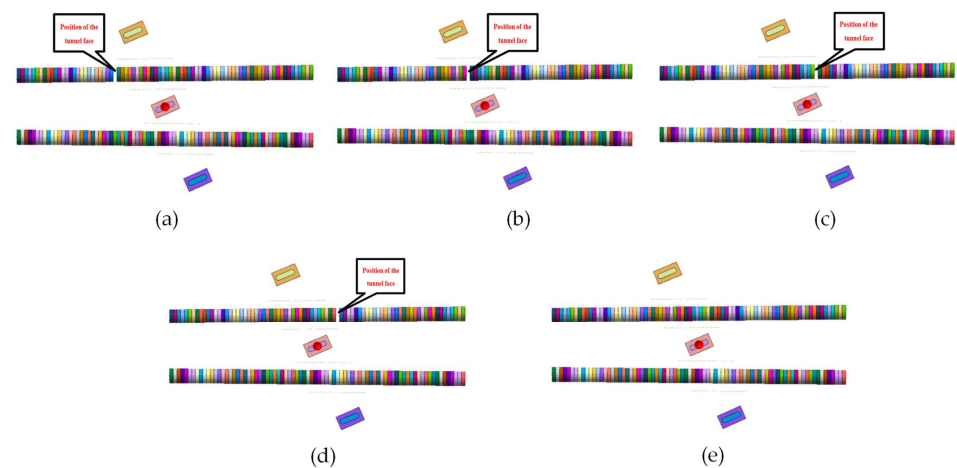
For the left line of the interval: (a) excavation advances to starting point of isolation piles; (b) excavation underneath the bridge; (c) excavation advances to the nearest point of the bridge foundation; (d) excavation advances to ending point of isolation piles; (e) completion of the construction.
